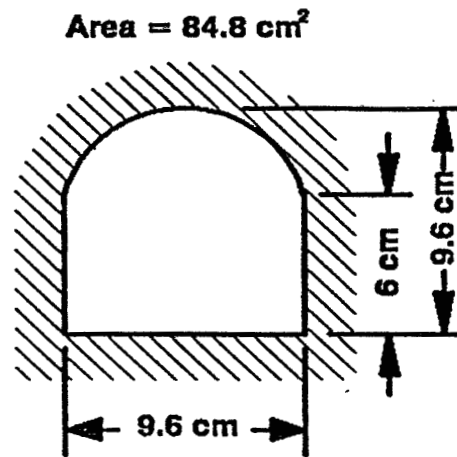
Access tunnel cross-section for 1:25-scale WES Brick Model Tests
